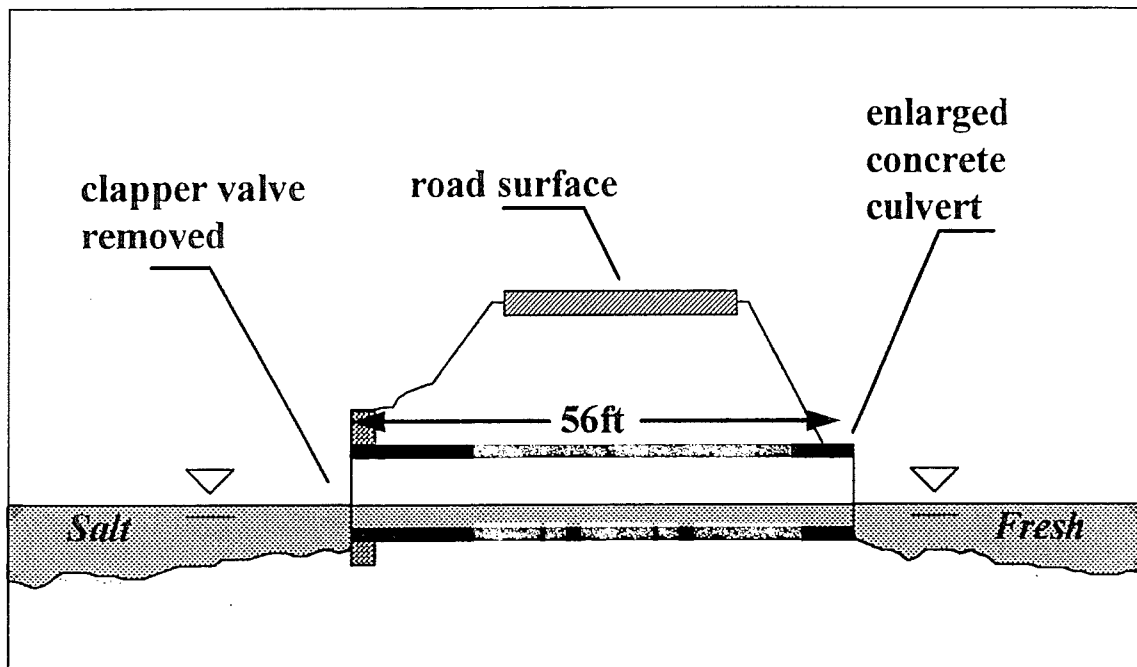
Cross sectional view of Wilders Dike with an enlarged culvert in place of the existing culvert
